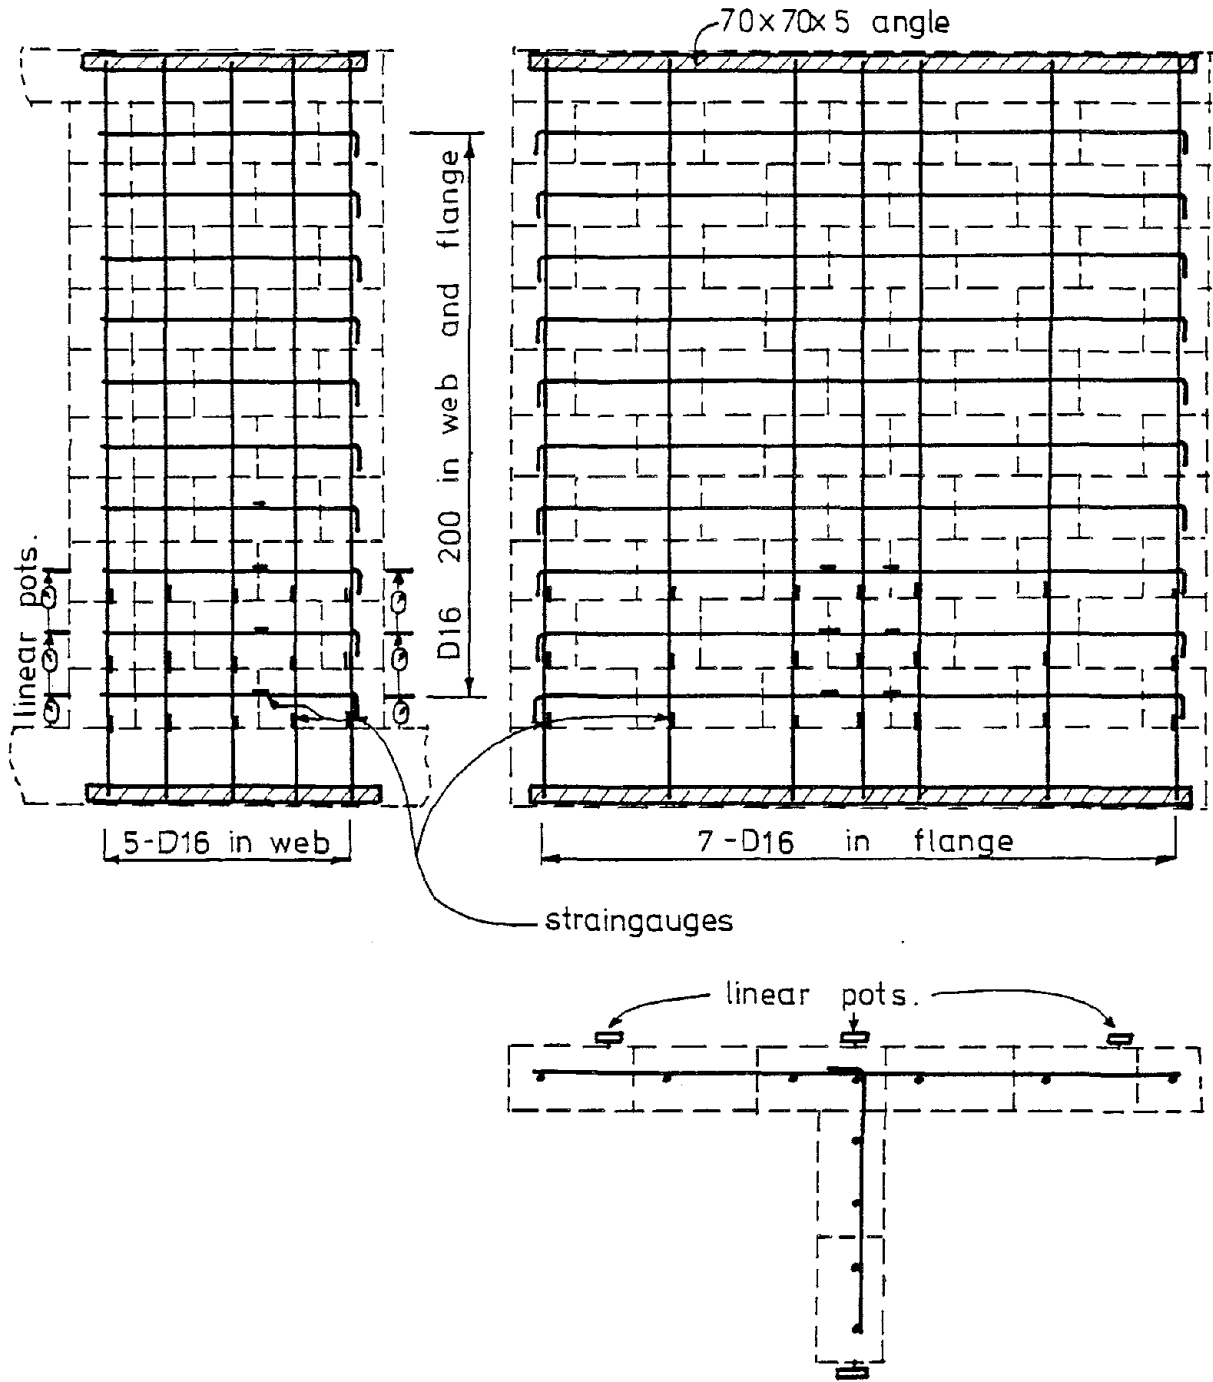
TEST WALL REINFORCEMENT AND INSTRUMENTATION
